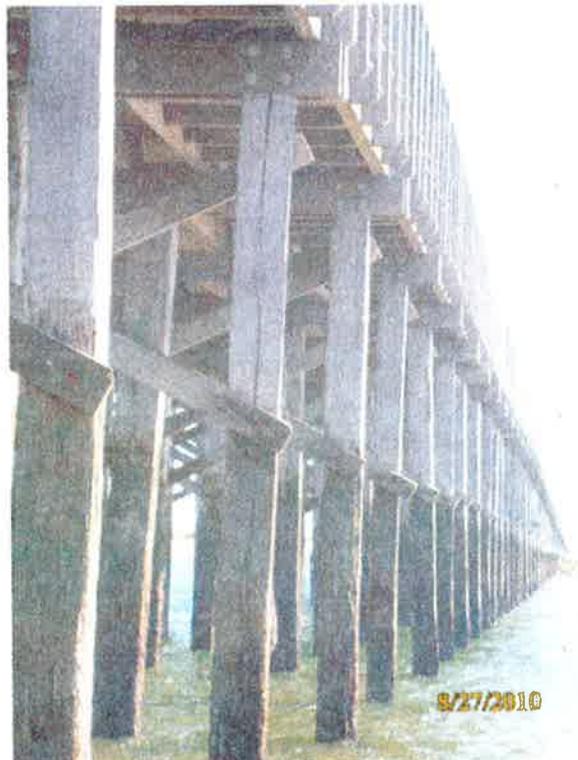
Bent #15, Pile "E", showing checks and ring checks at the corners.
